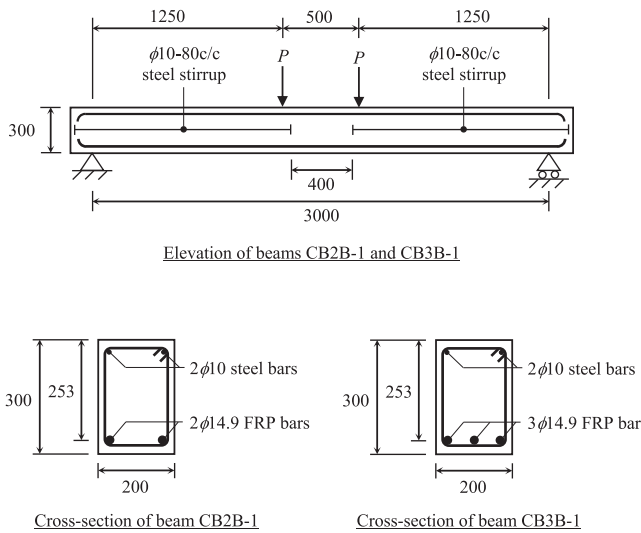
Layout of beams CB2B-1 and CB3B-1 (dimensions in mm).
